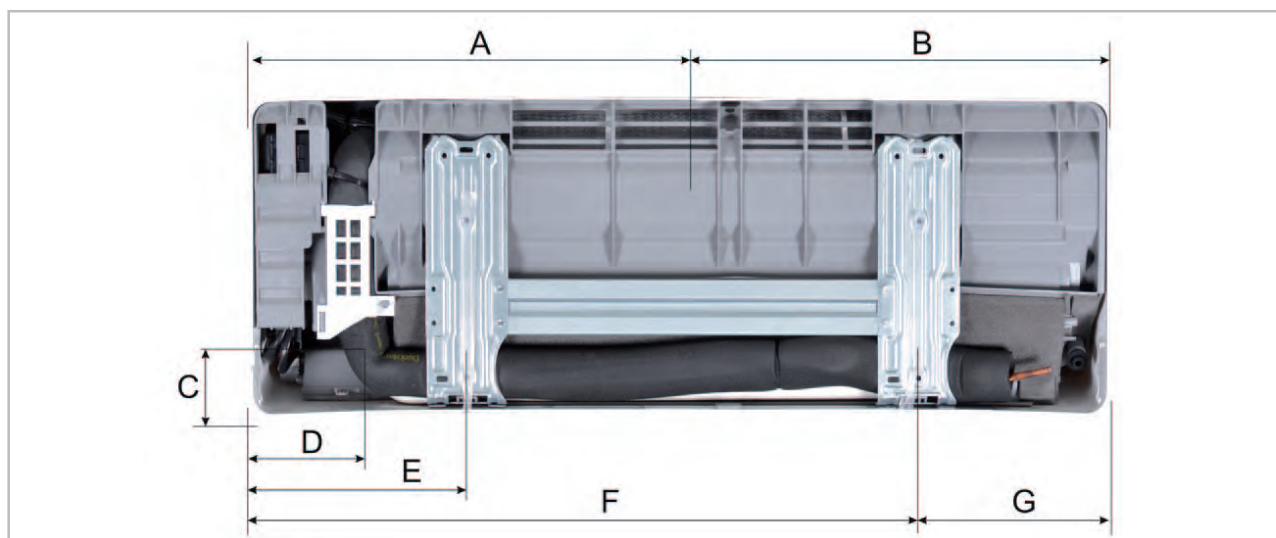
Mounting points for the wall bracket MVW 222-282 (all dimensions in mm)
